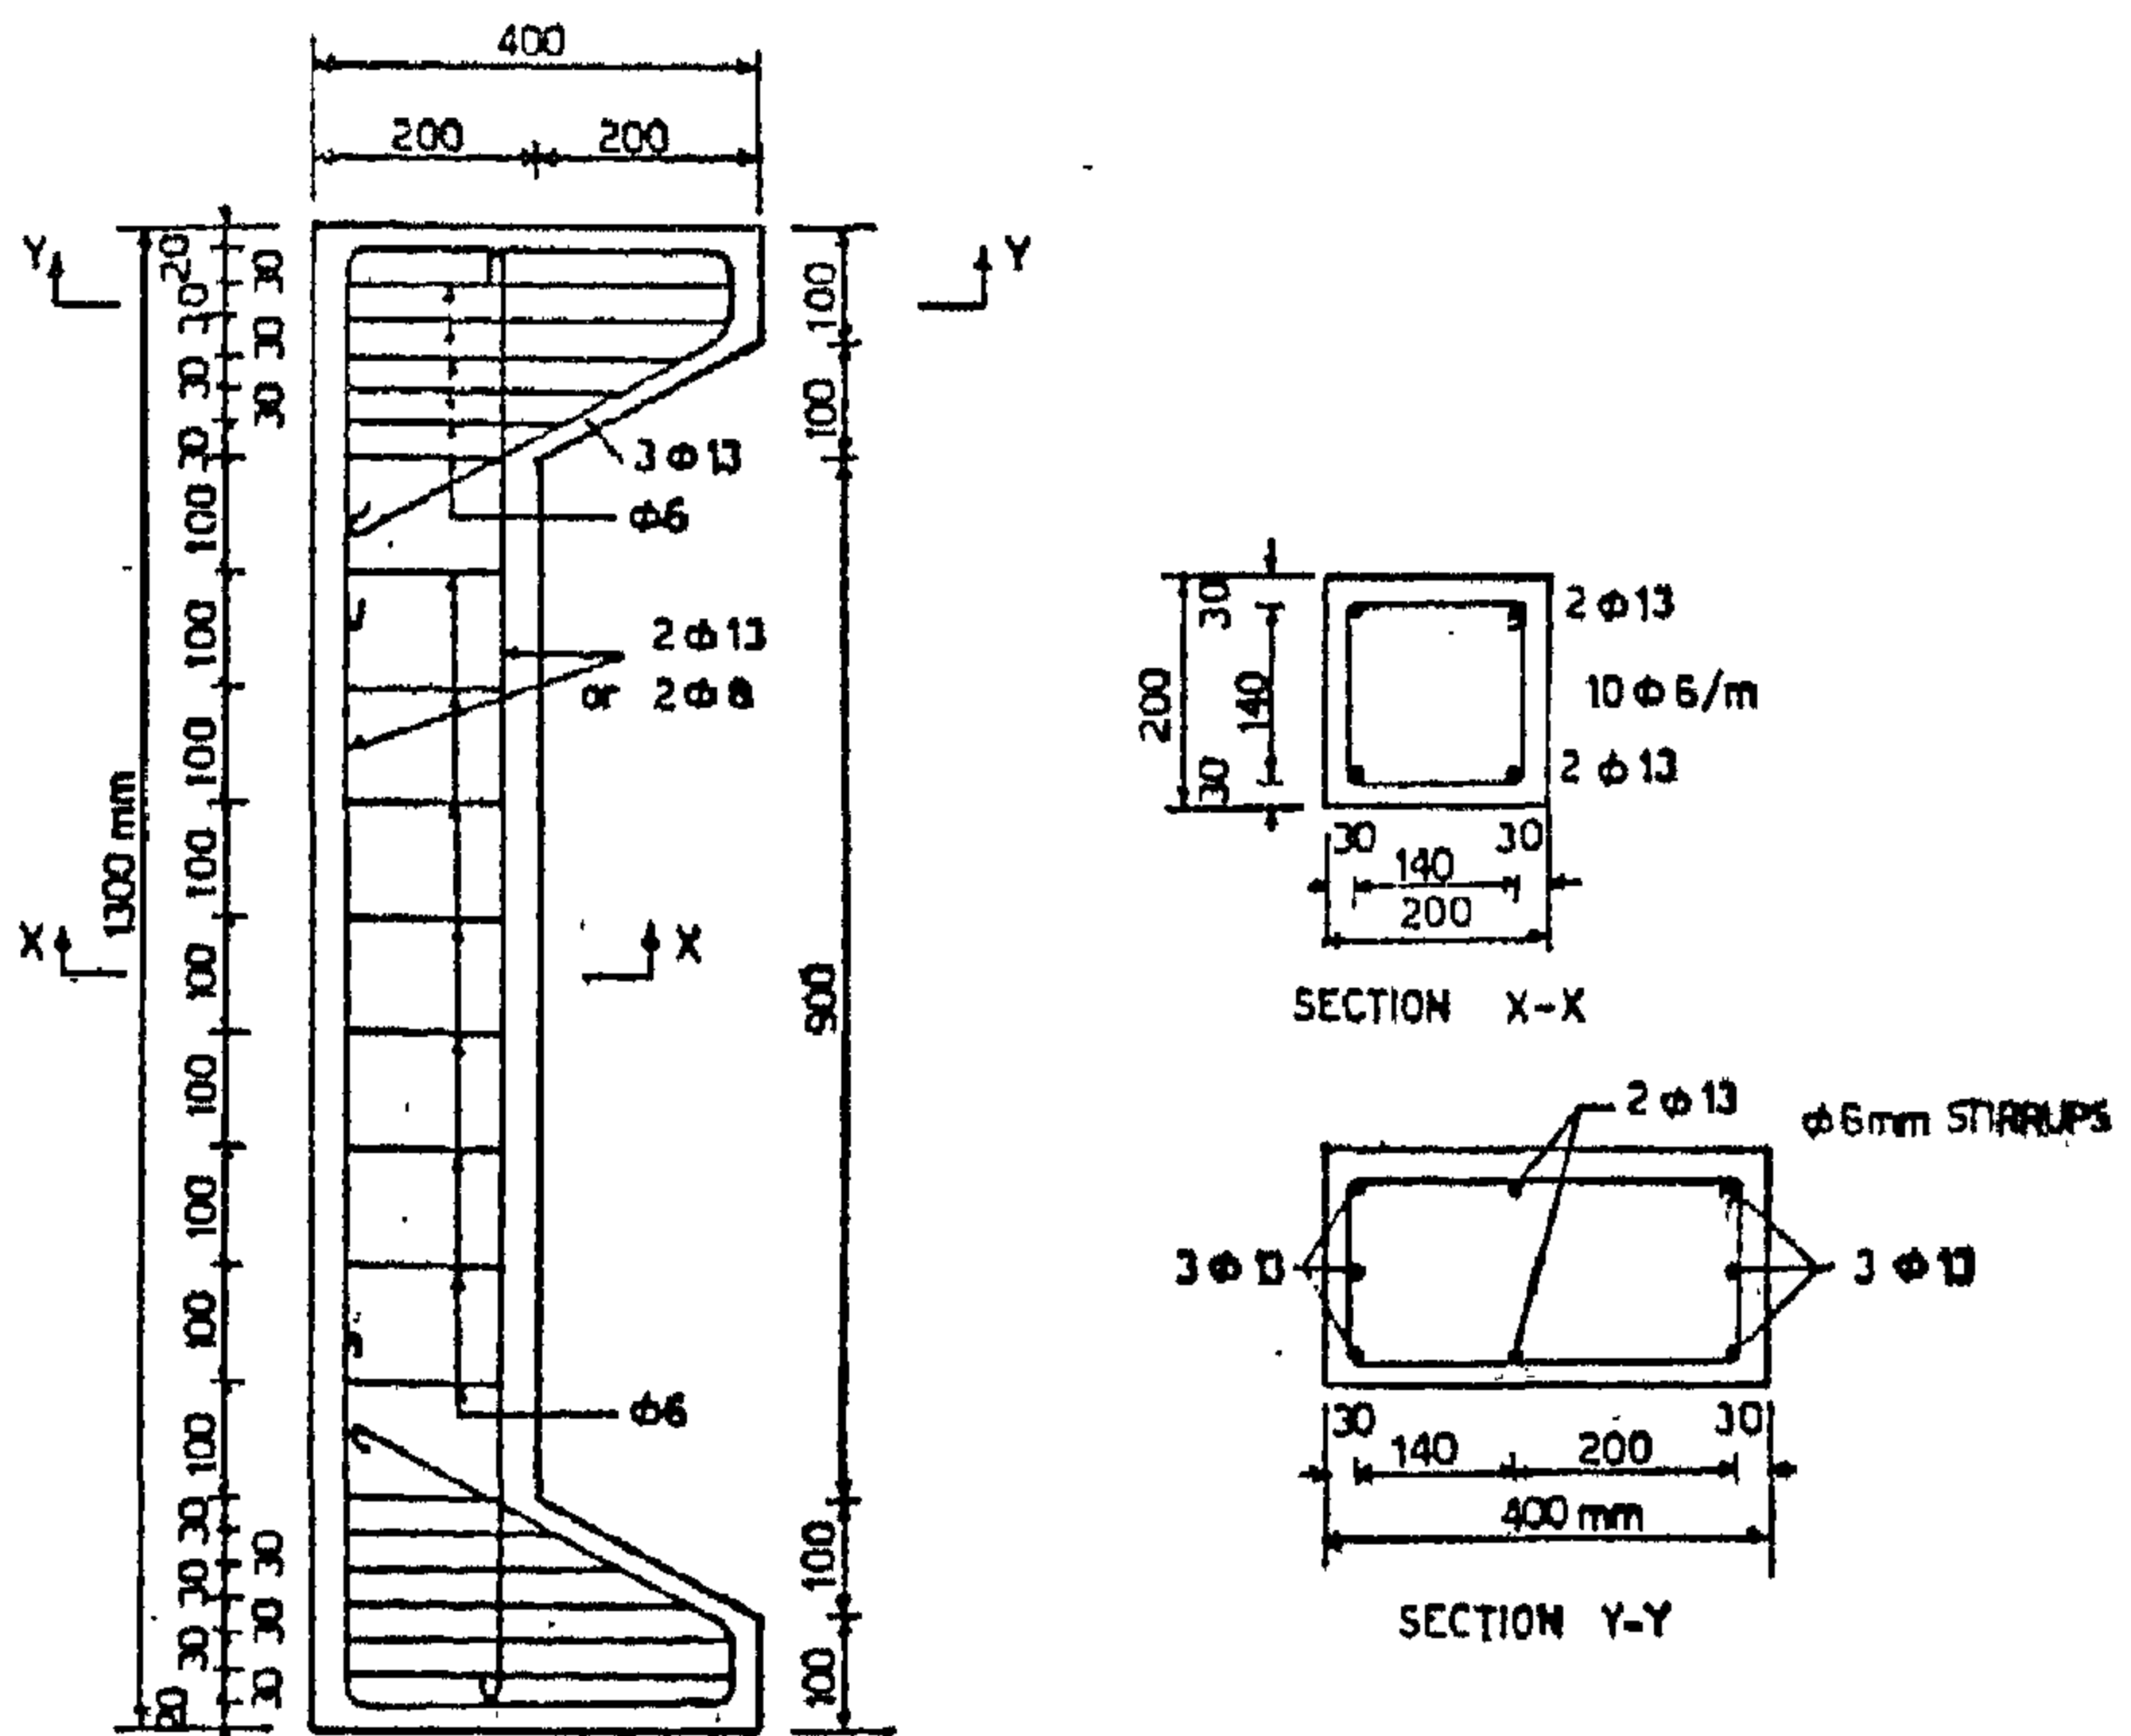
DETAILS OF COLUMN REINFORCEMENT.
